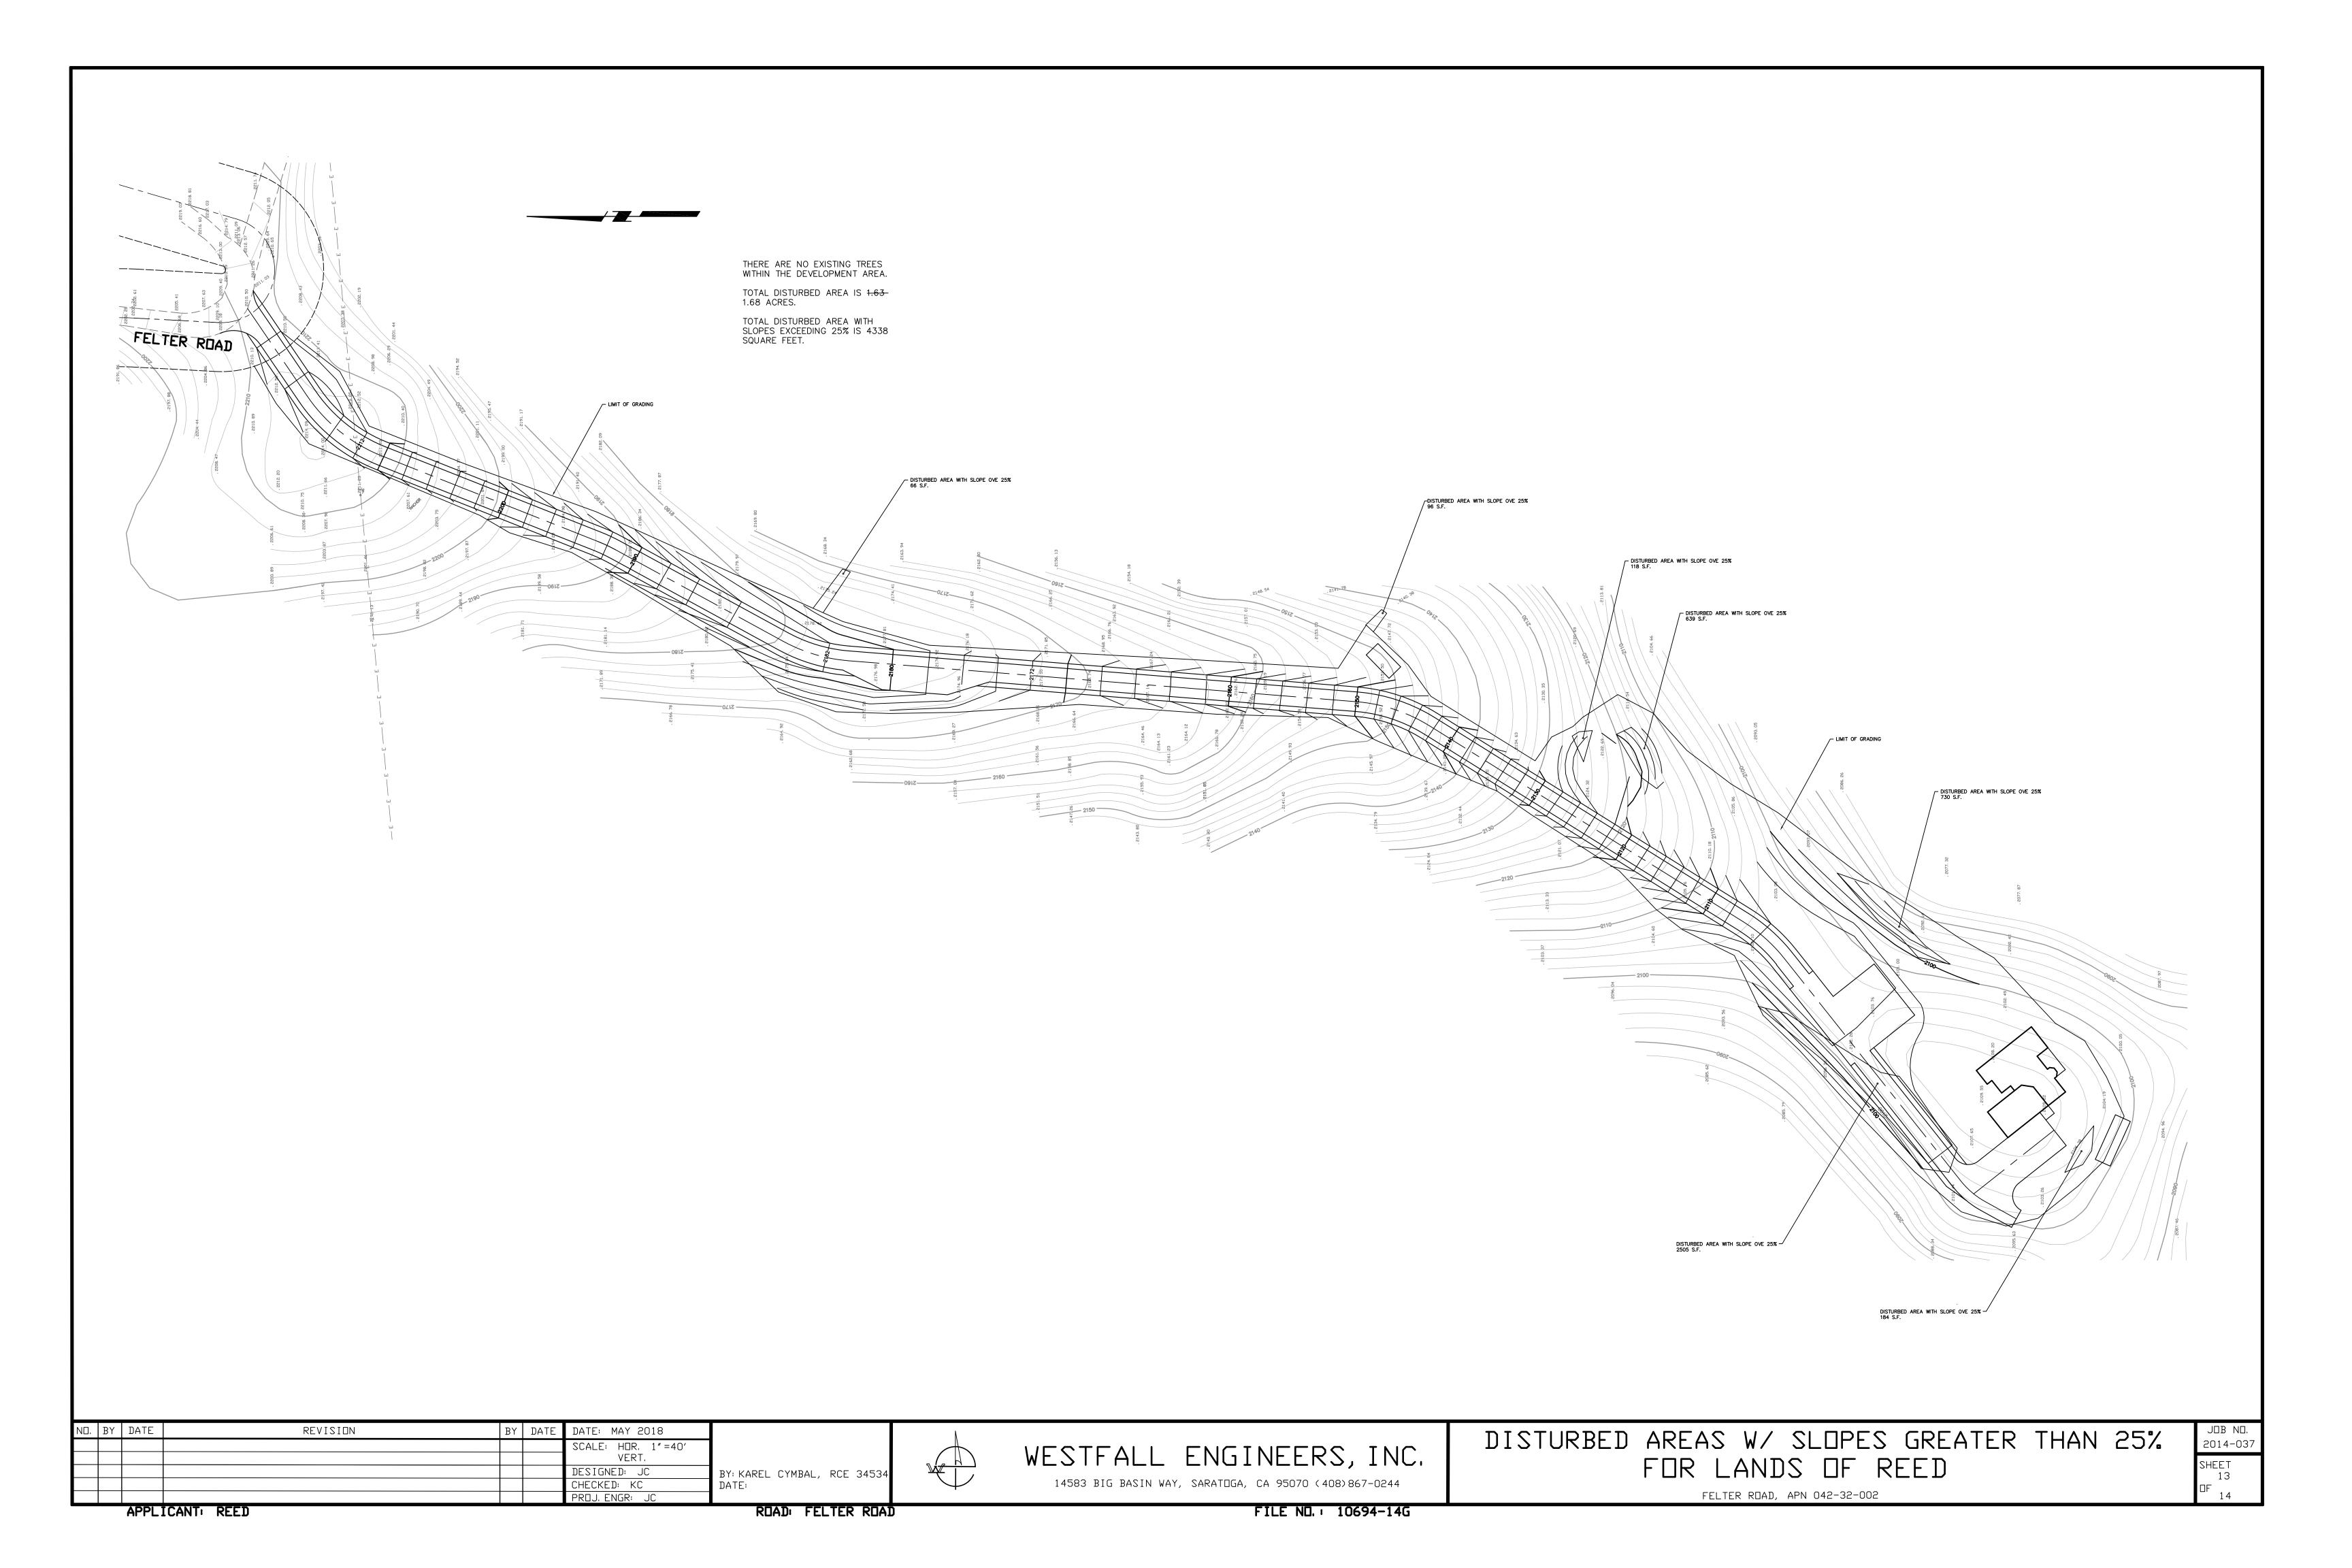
Habitat Plan Conditions of Approval File 10649-14G APN: 042-32-002 Felter Road
